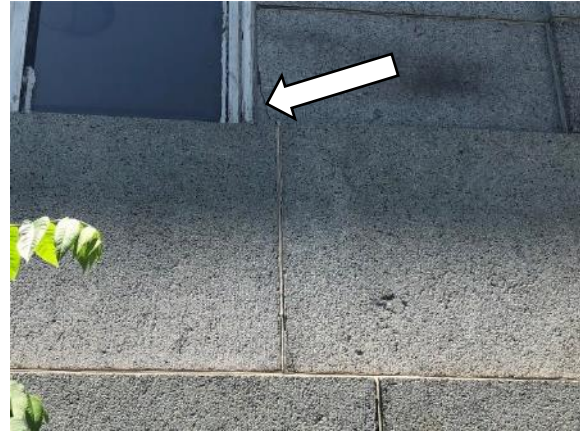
Step crack (arrow) originating from a window in the front elevation
